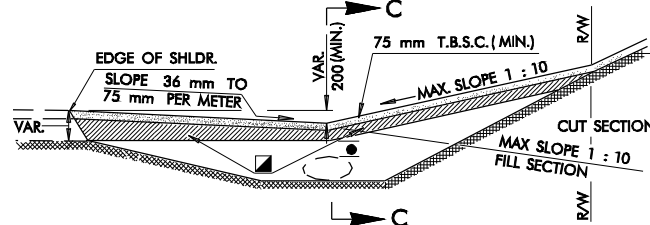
DETAIL OF SURFACED SECTION LINE RETURNS & RURAL DRIVES
